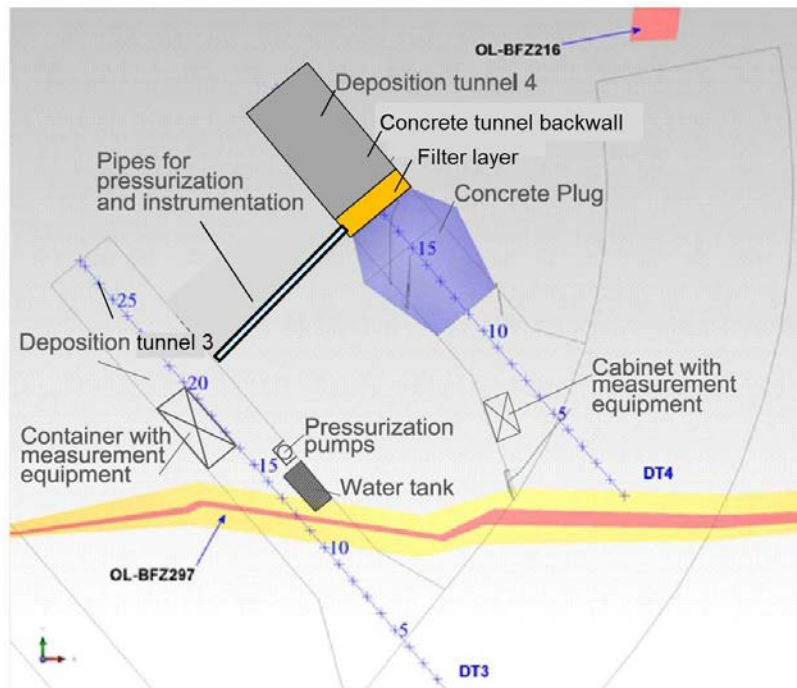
Horizontal section of the demonstration tunnels 3 and 4 with the concrete plug, the measurement and pressurization equipment. Note that OL-BFZ297 indicates a brittle fault zone in the rock.
